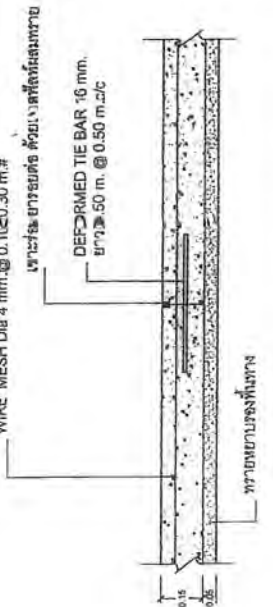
CONSTRUCTION JOINT (รอยต่อเพื่อการหดตัว)
